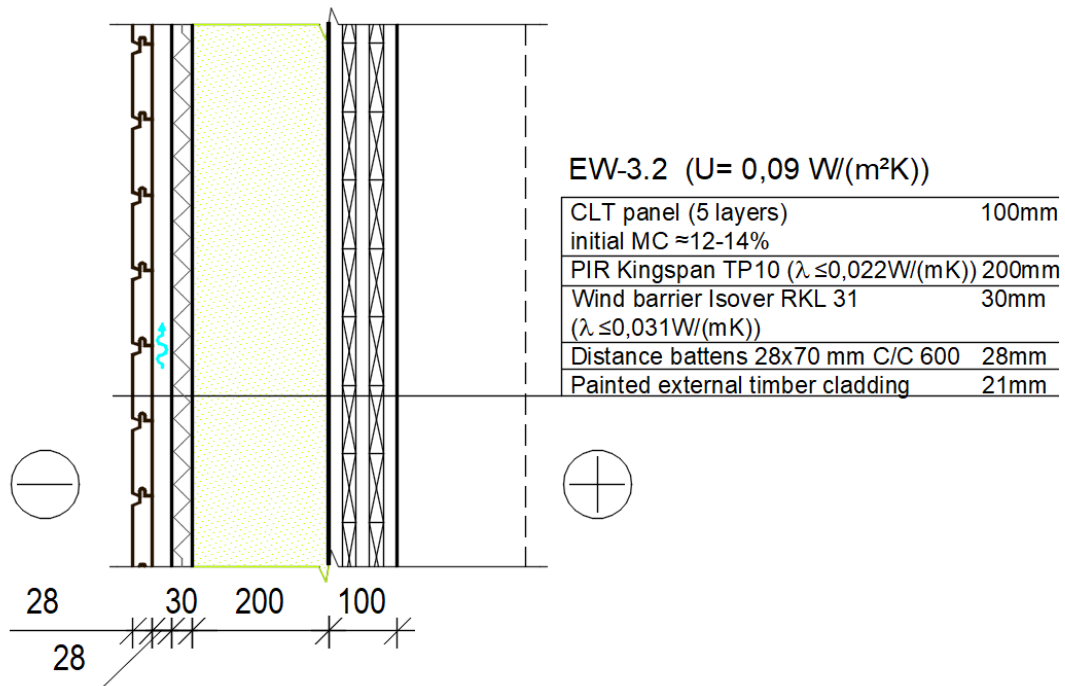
Wall type EW-3.2 (Technical drawing by V.Kukk, adjusted by author)
